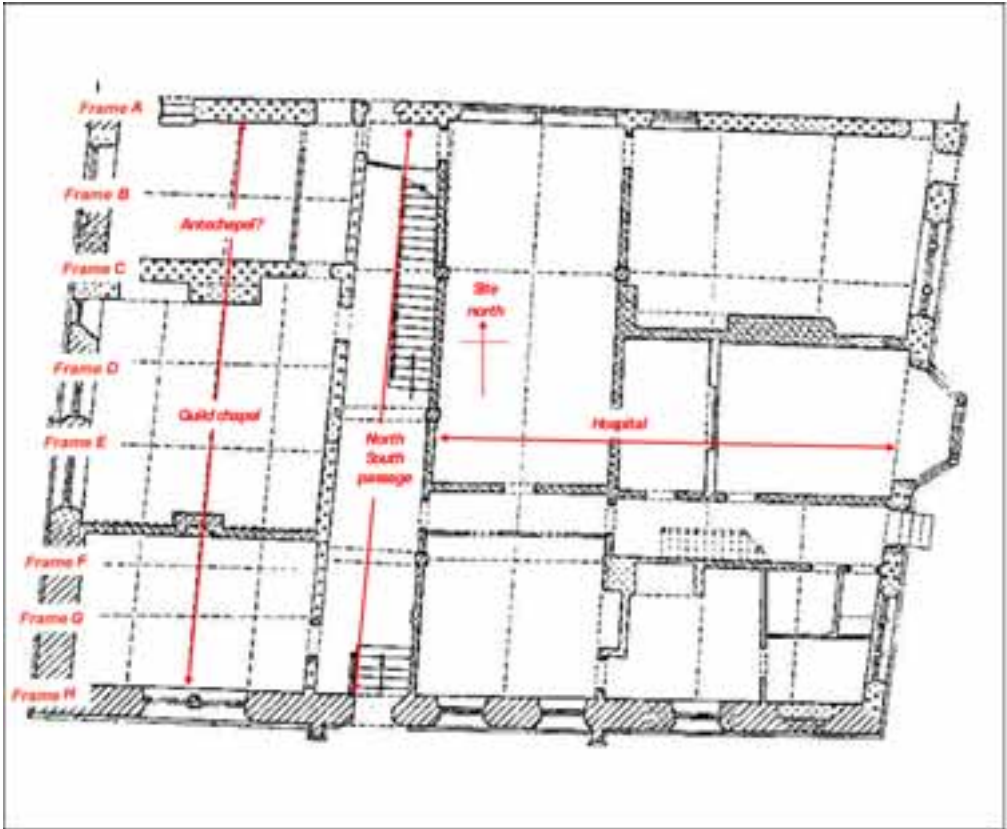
Plan at ground-floor level to show layout of building and position of the chapel trusses
